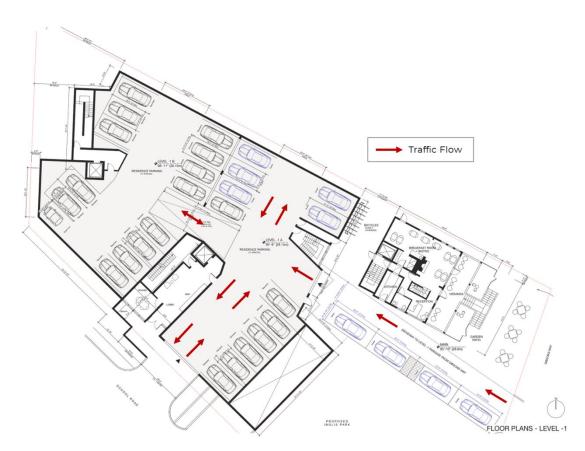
One-Way Traffic Flow across the site between Gibsons Way and School Road
